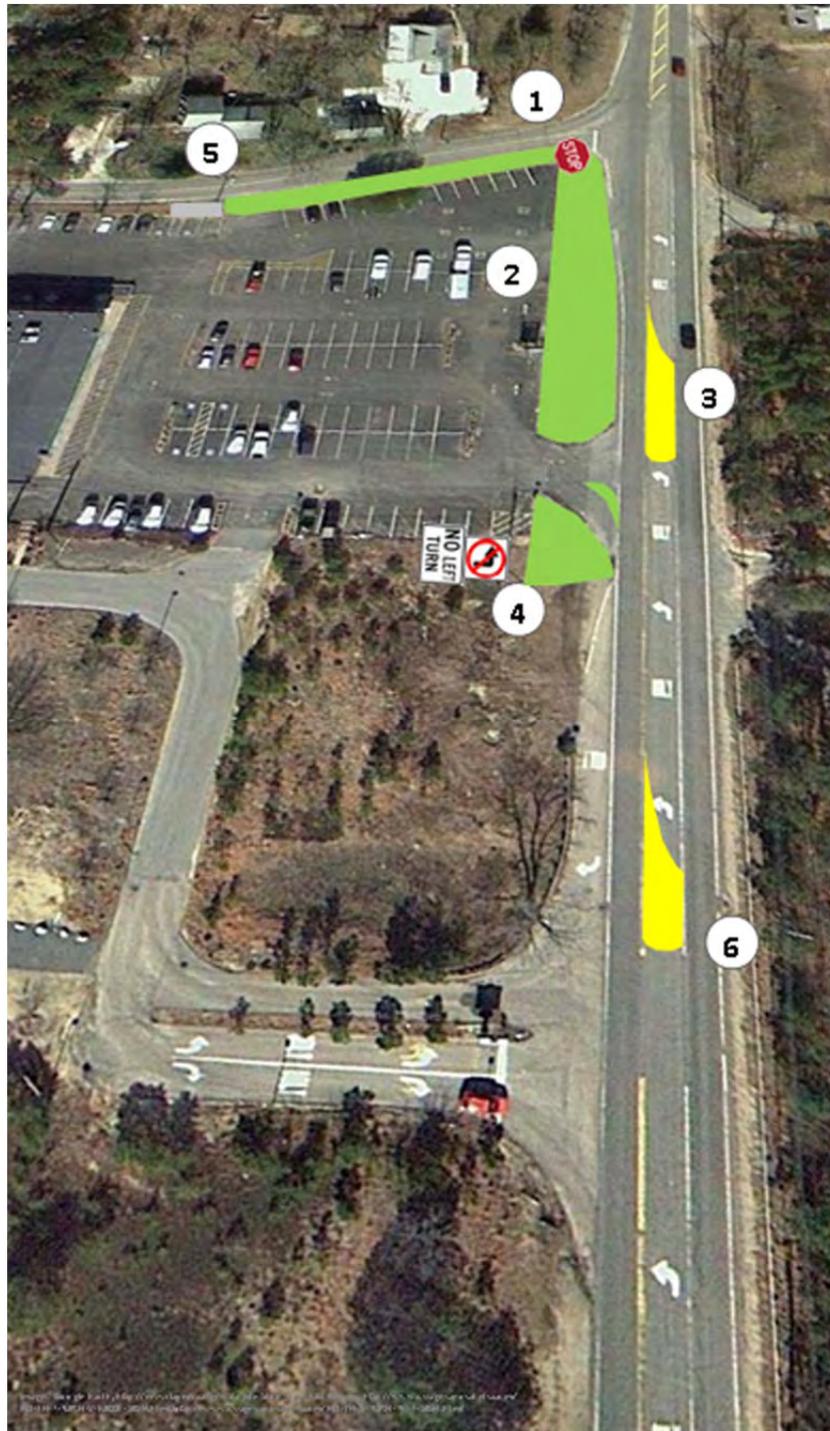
ROUTE 6 AT COVE ROAD - POTENTIAL IMPROVEMENT AREAS
